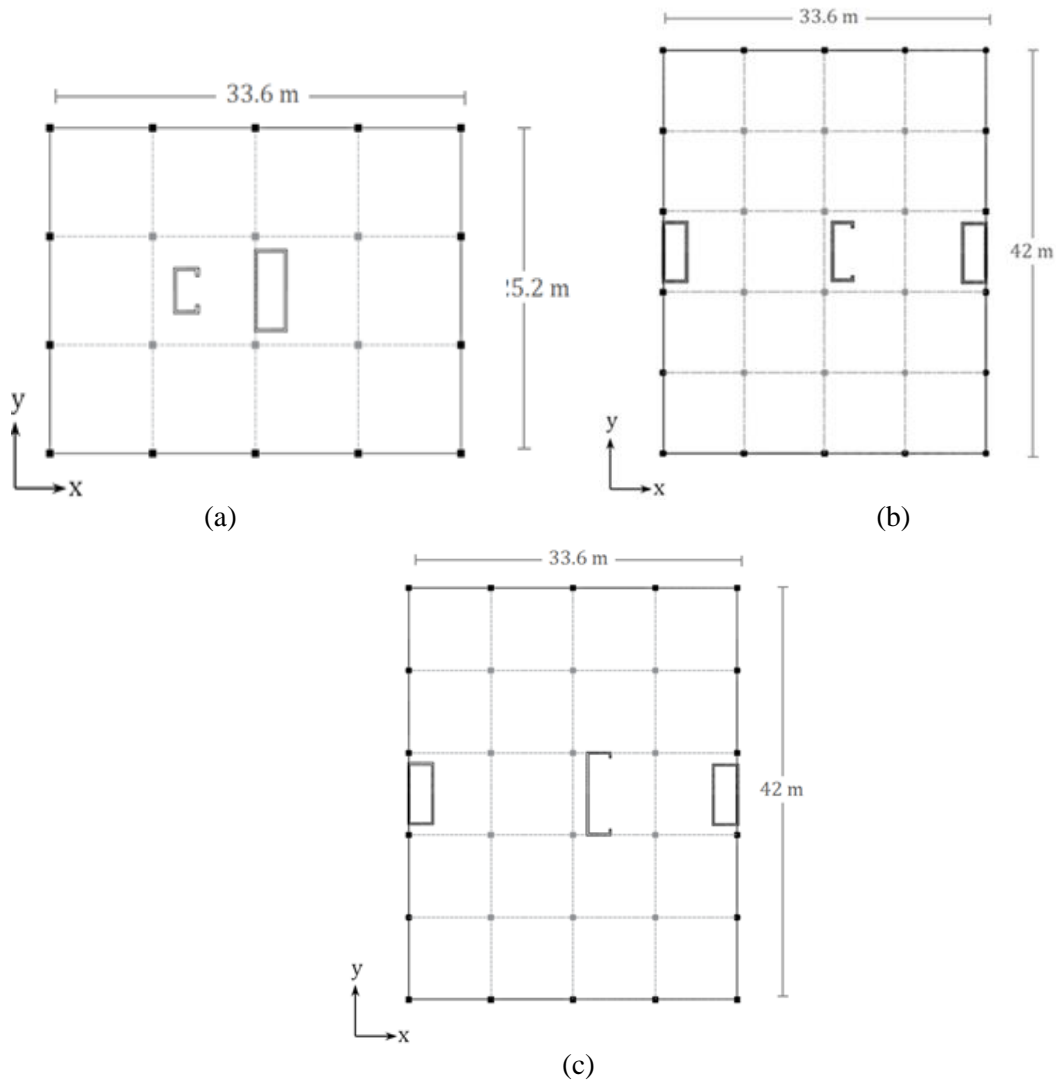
BUILDING PLANS OF ARCHETYPE BUILDINGS, (A) 2-STOREY, (B) 5-STOREY AND (C) 9-STOREY
